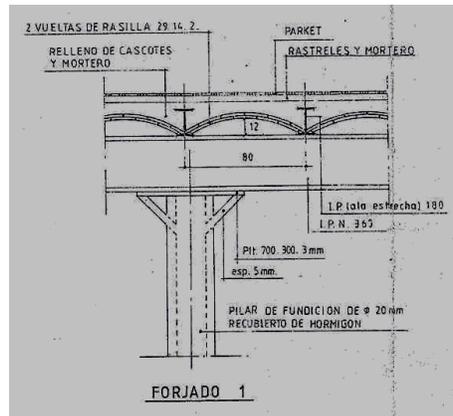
Detail of the slab with steel beam and ceramics ceiling vaults (taken from the original architectonic plans of the building).
